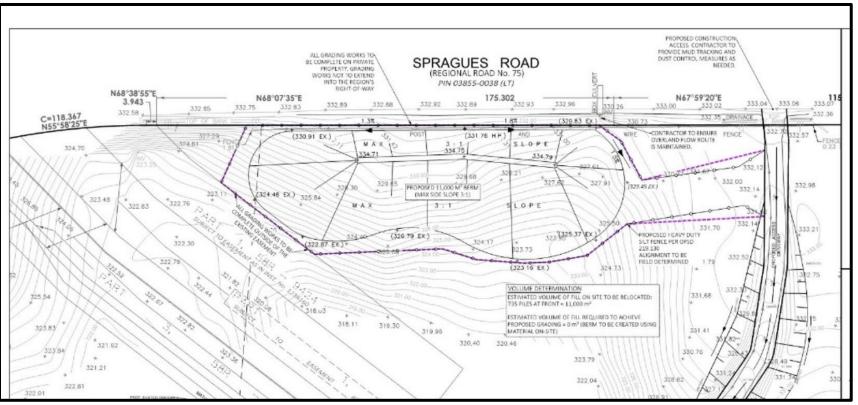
Detail of Proposed Berm (Provided by Slotegraaf Construction 2024)
